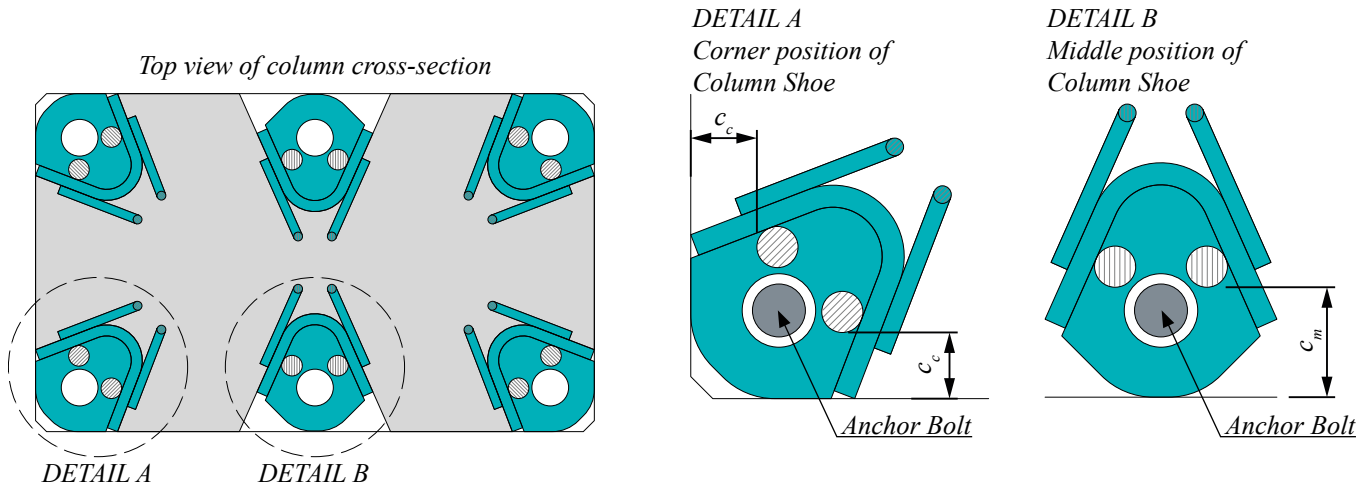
Concrete cover of main anchor bars – corner and middle position of column shoe.
